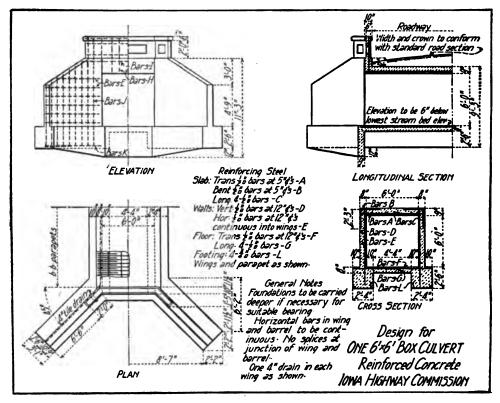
CONCRETE BOX CULVERT. IOWA HIGHWAY COMMISSION.
